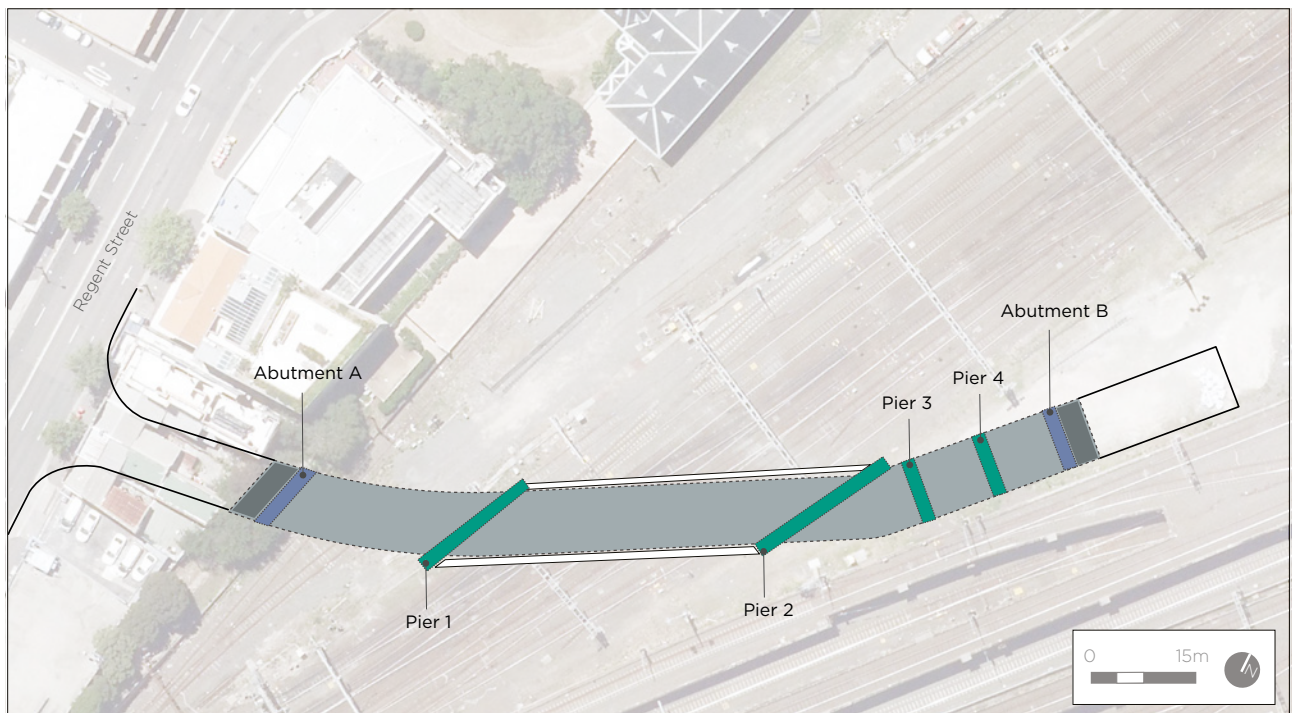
Sydney Yard Access Bridge – indicative plan view
